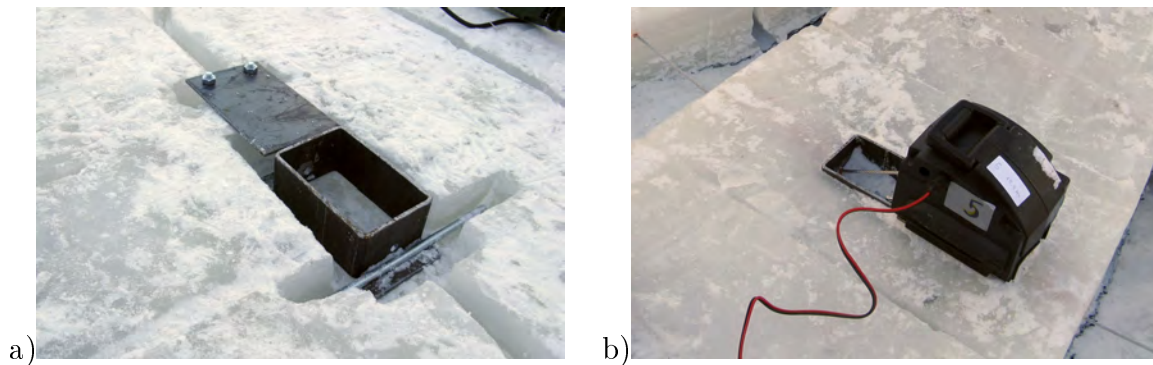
Winches a) built-in steel parts to anchor the winches b) winch
